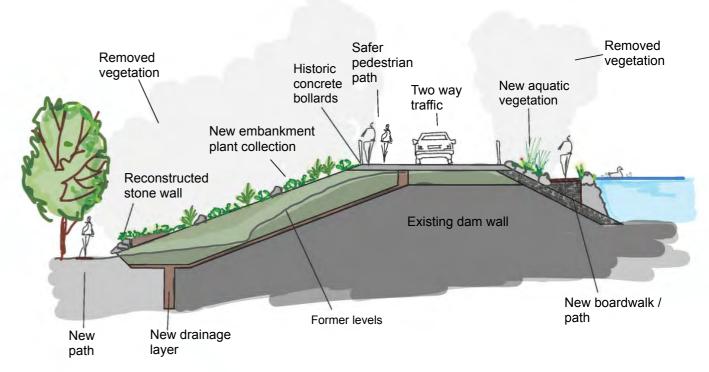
Draft Concept for the new Gong embankment, Cornish Street and boardwalk. Concept subject to Engineering approval.
